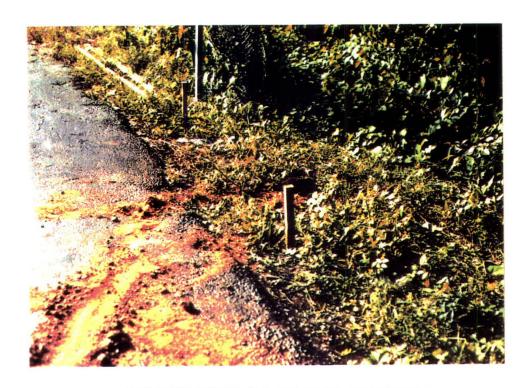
PHOTO DOCUMENTATION OF SOIL EXCAVATION LABORATORY REPORTS
